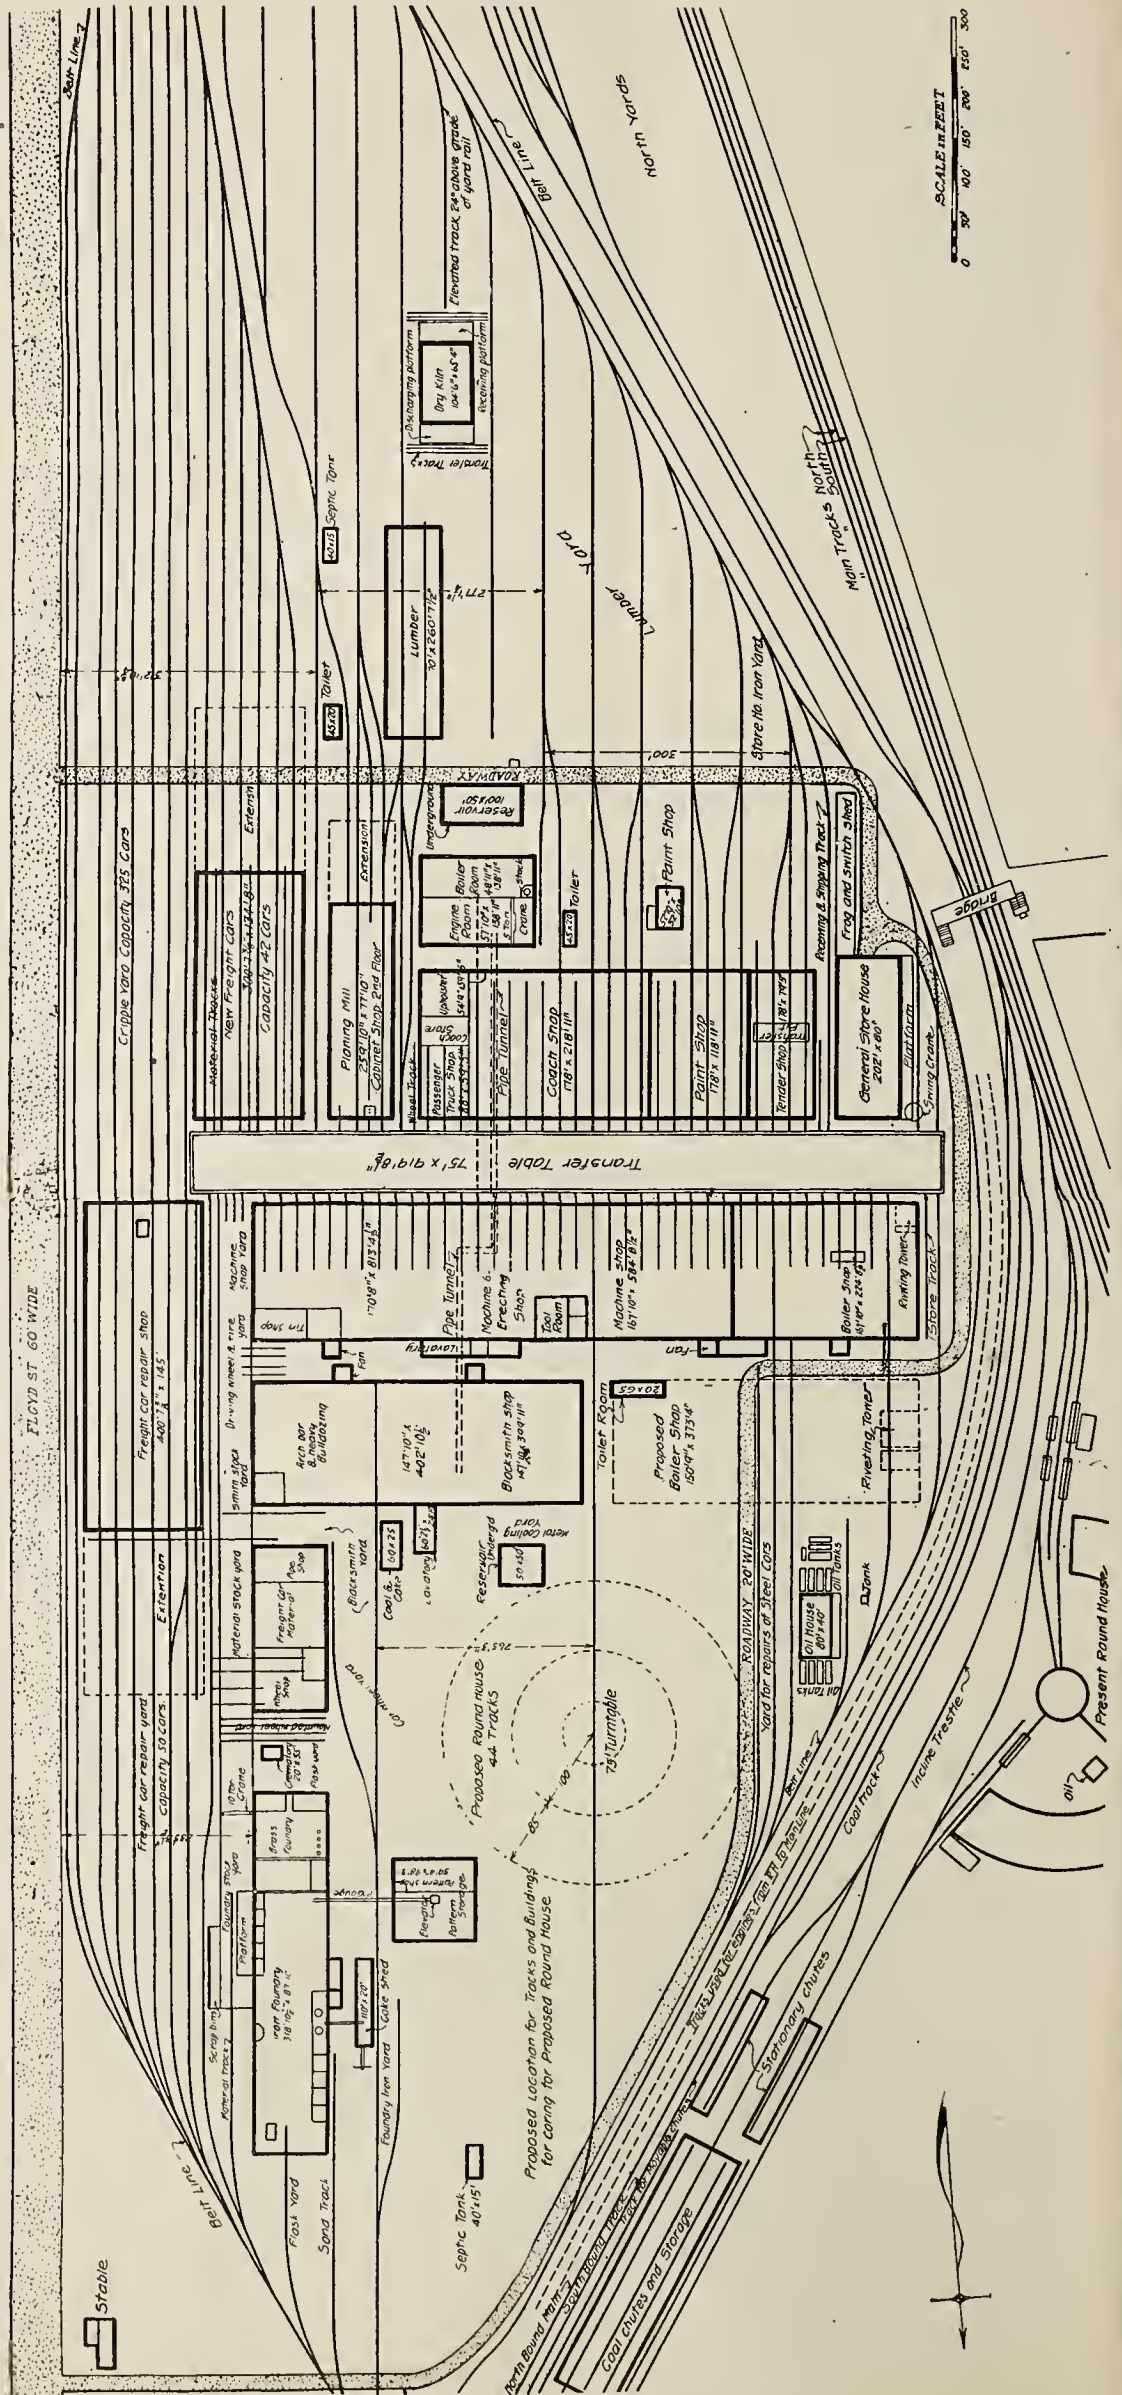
GENERAL LAYOUT, L. & N. SHOPS AT SOUTH LOUISVILLE.
